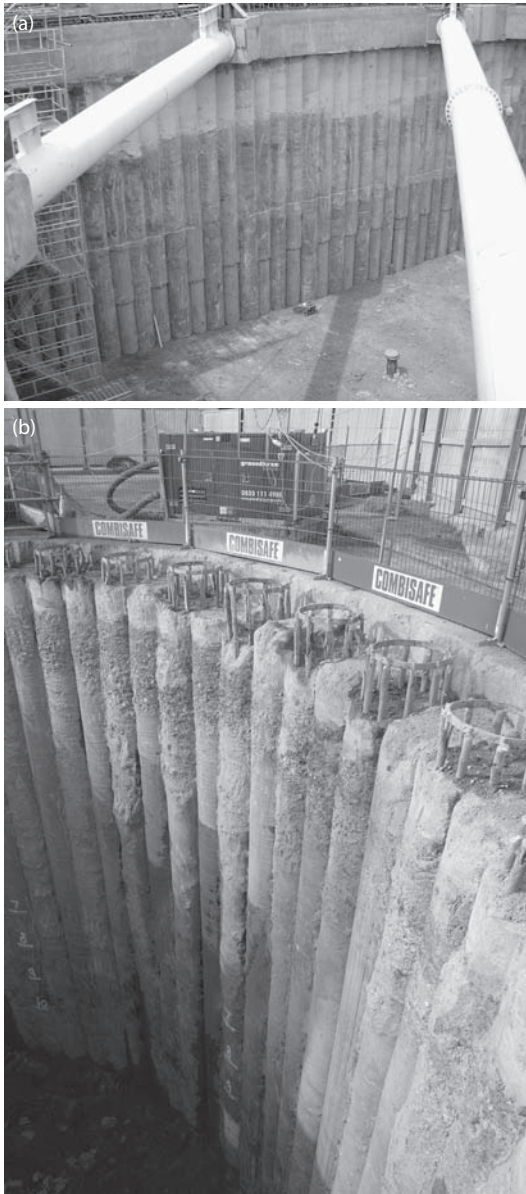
Secant pile wall. (a) Secant pile wall exposed by excavation. (Courtesy of Balfour Beatty Ground Engineering, Basingstoke, U.K.) Bored pile wall is capped by a concrete beam and supported by tubular steel props. (b) Secant pile wall exposed, showing unreinforced female piles and reinforced male piles. (Courtesy of Bachy Soletanche, Burscough, U.K.)
